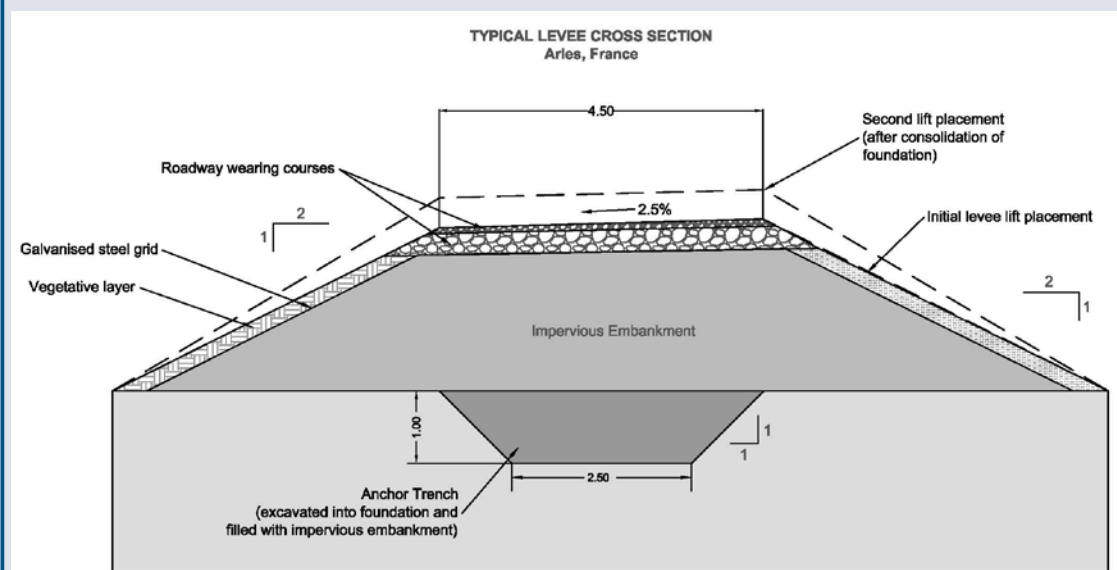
Typical levee cross-section near Arles, France (courtesy EGIS)
